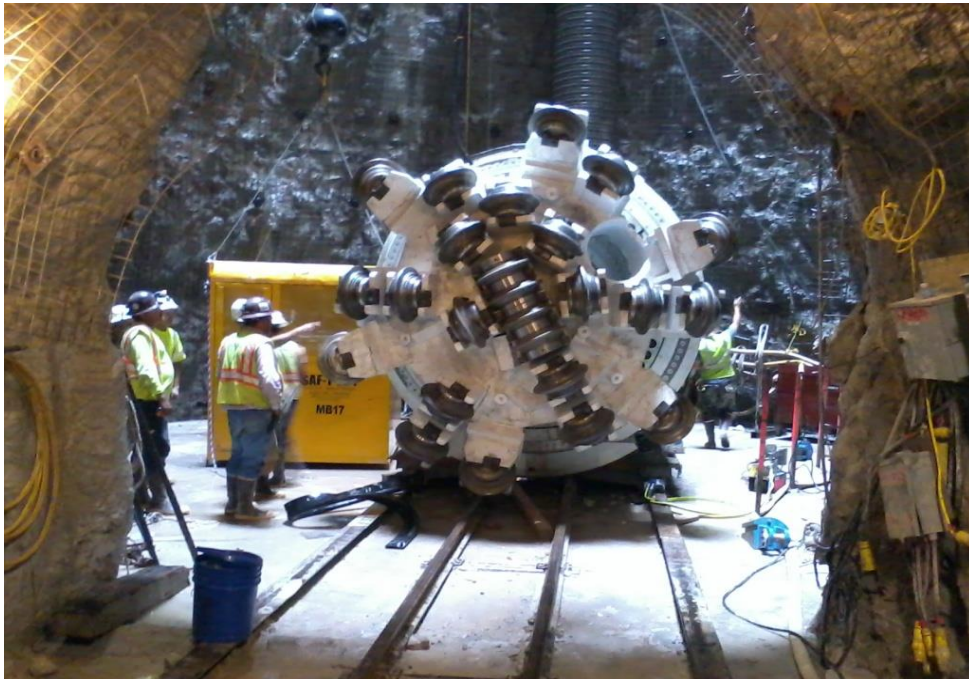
Robbins manufactured cutter head. This particular cutter head was used on Reach #2 of the Jollyville Transmission Main project in Austin, Texas.
